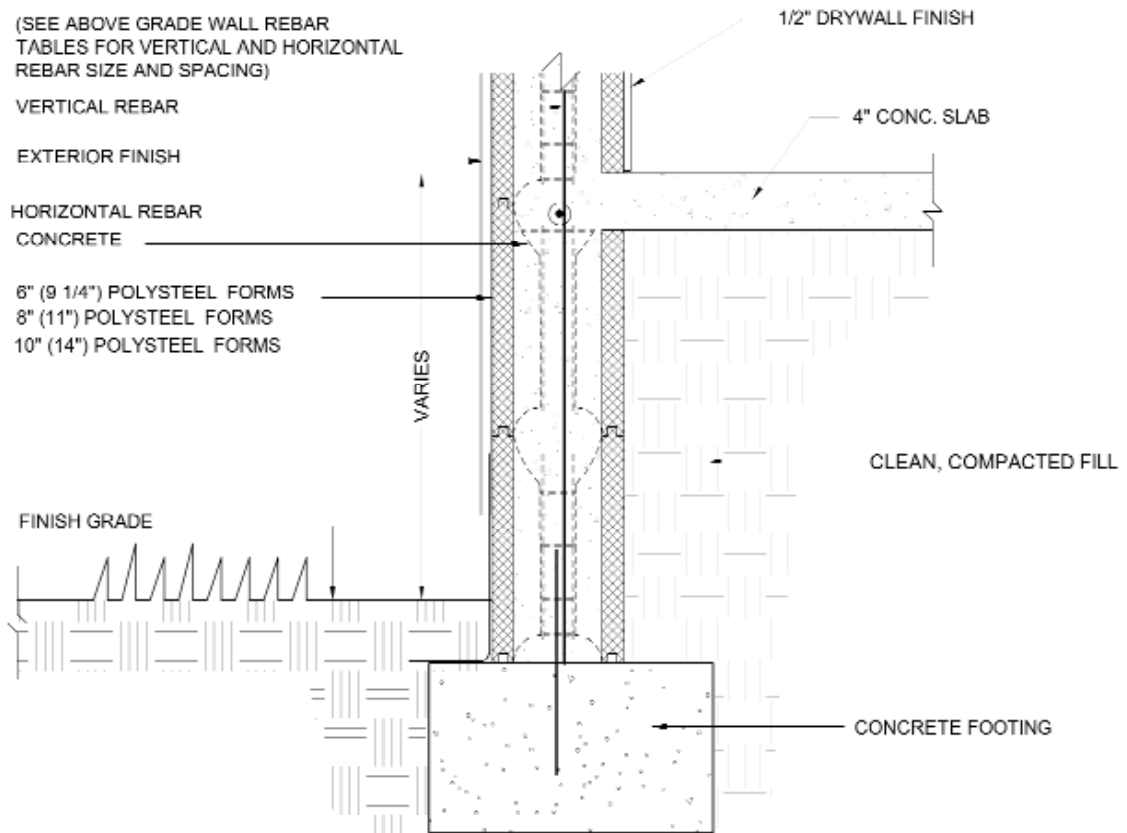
STEM WALL AND INTEGRATED SLAB
